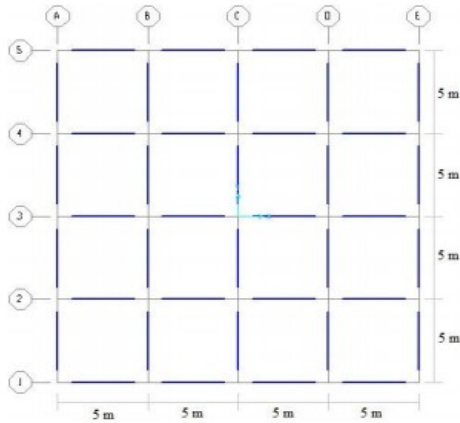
PLAN OF G+5 & G+9 STORY BUILDING OF ALL MODELS
